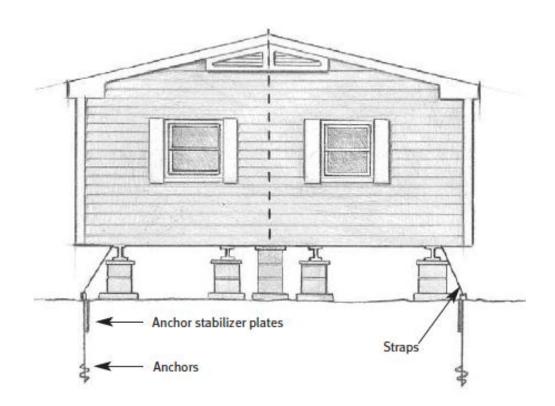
Bearer to Anchor Connection (MHRA, 2002)
